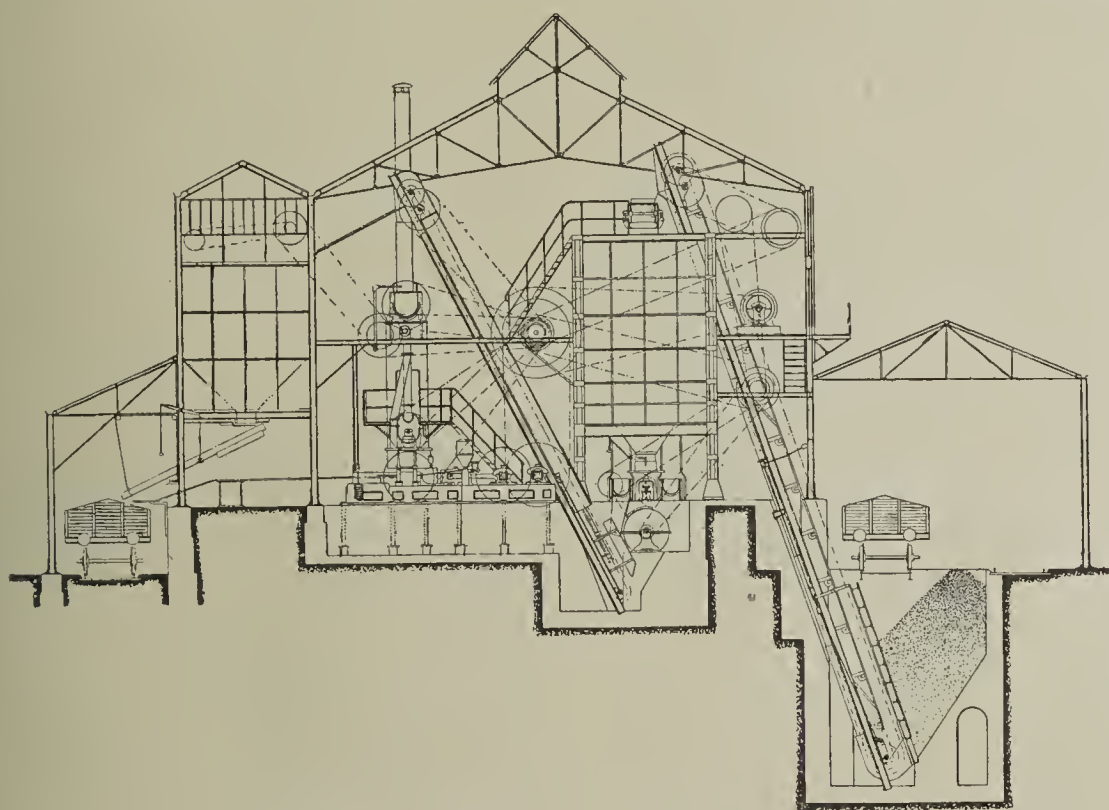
CROSS SECTION OF BRIQUETTING PLANT.
